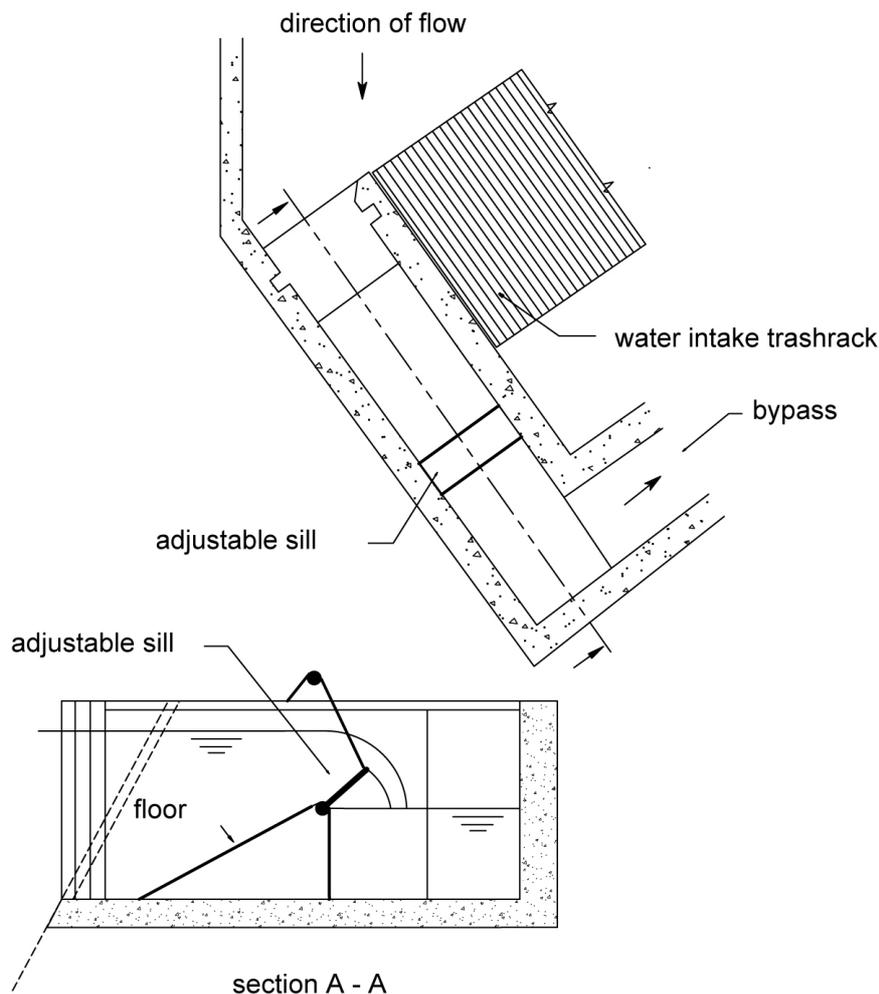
Conceptual plan and section of a downstream bypass entrance.
